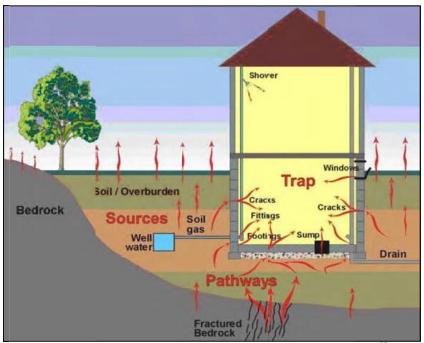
Sketch of Radon Entry Points into a House⁹⁹
